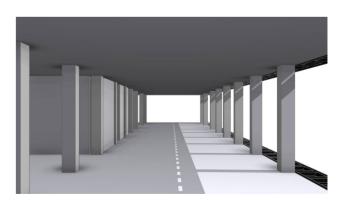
Modeling of typical floor on the winter equinox (by Author)
